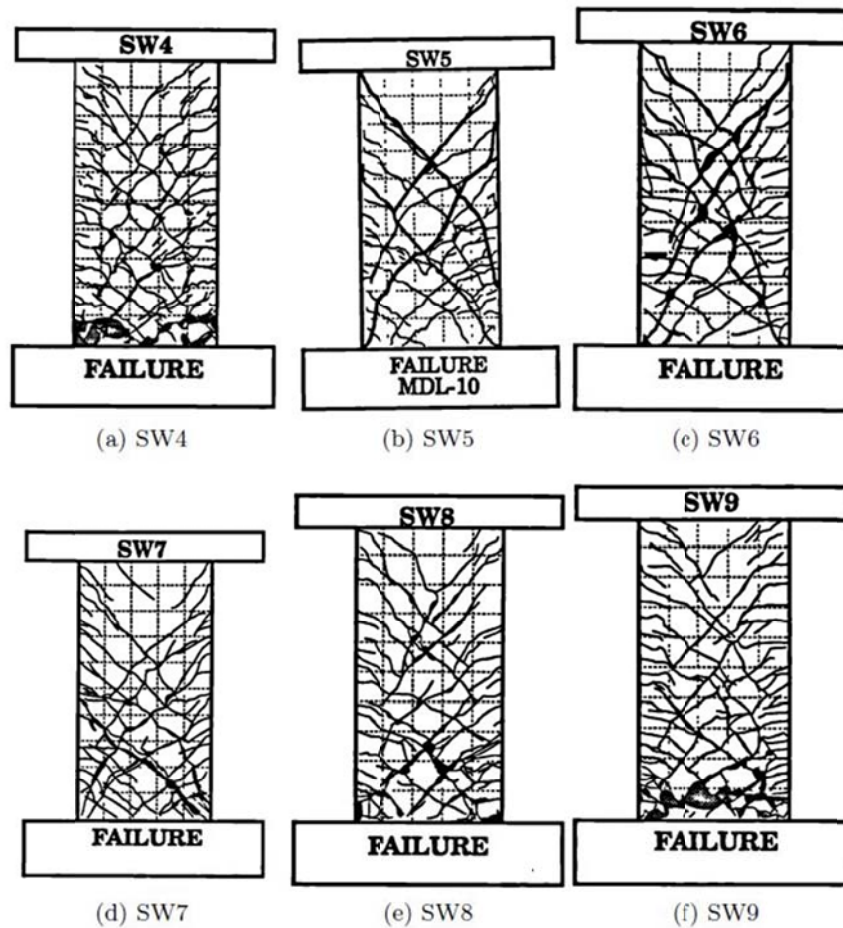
Damaged specimens of Pilakoutas and Elnashai (1995)
